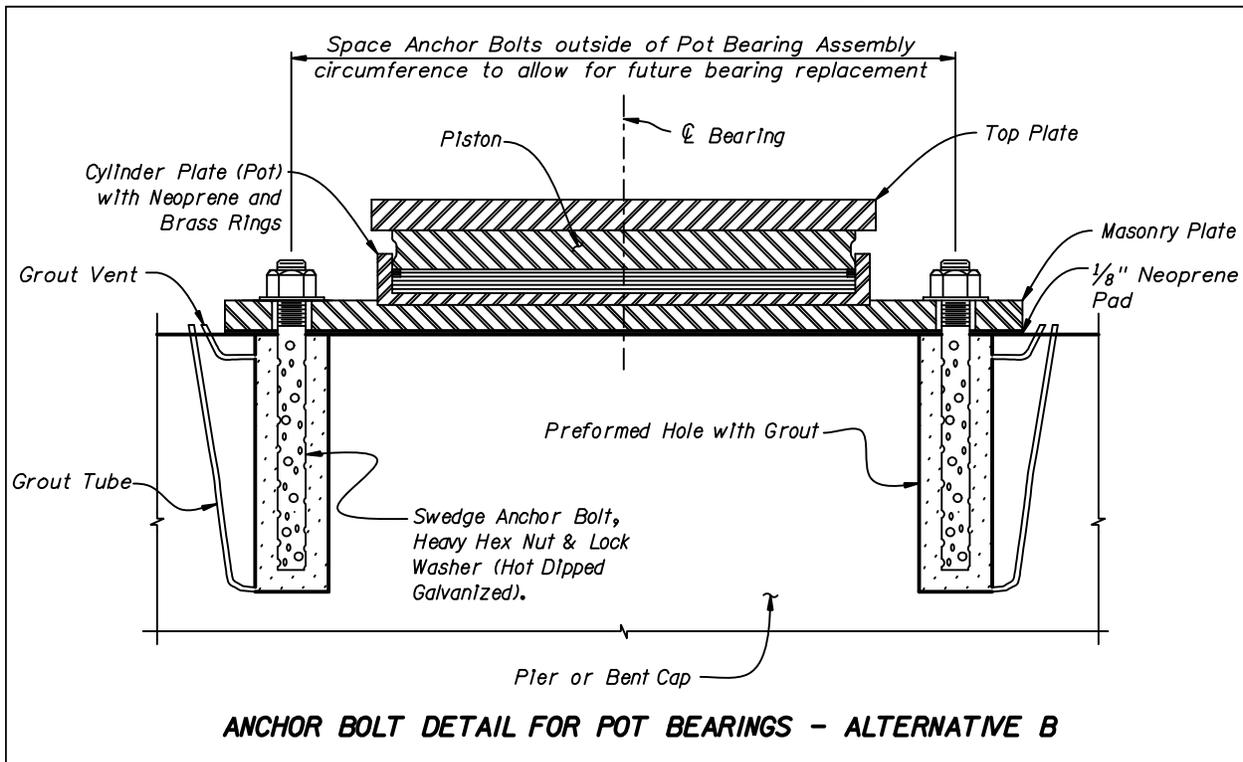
Anchor Bolt Detail for Pot Bearings - Alternative B
